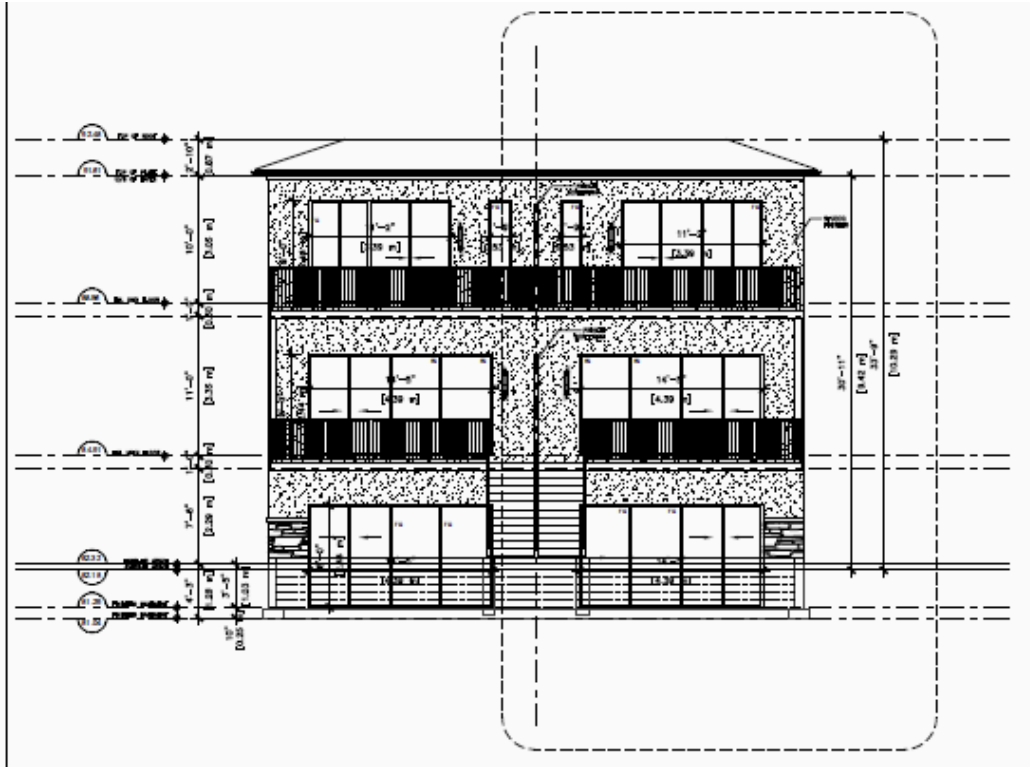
Rear elevation of 10 Mississauga Road North. *(Image from owner.)
